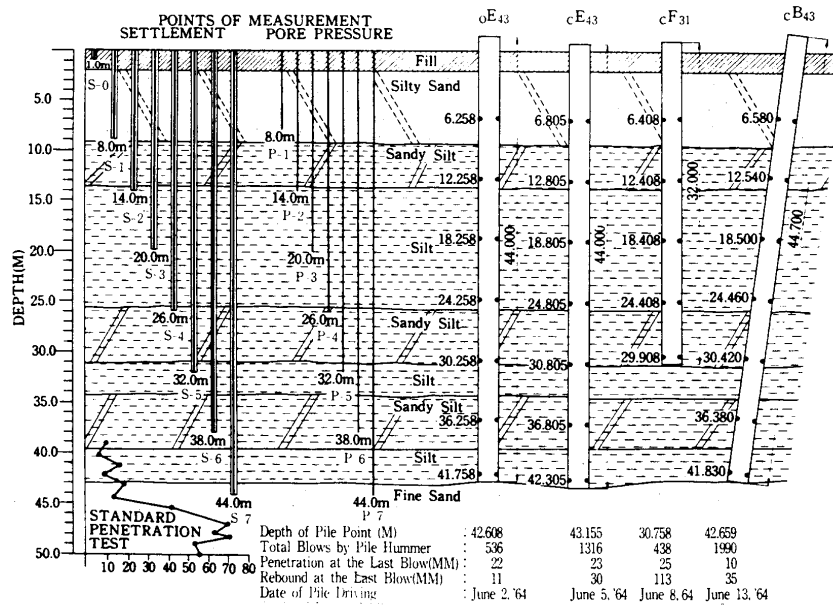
Vertical view of test site and piles (Endo et al., 1969)
